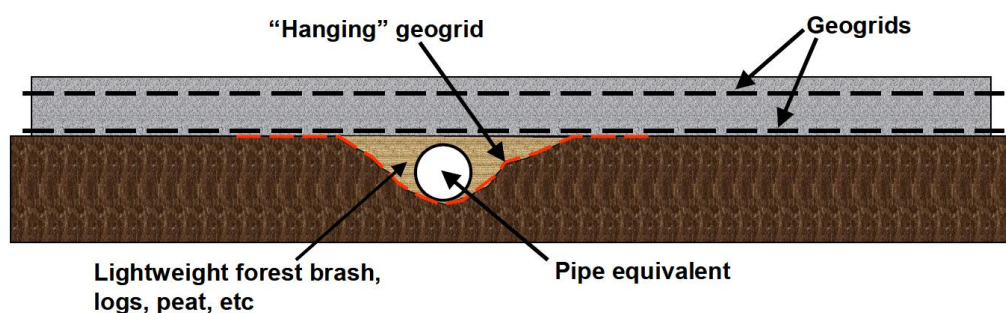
Dealing with ditches and natural peat pipes below a floating road
